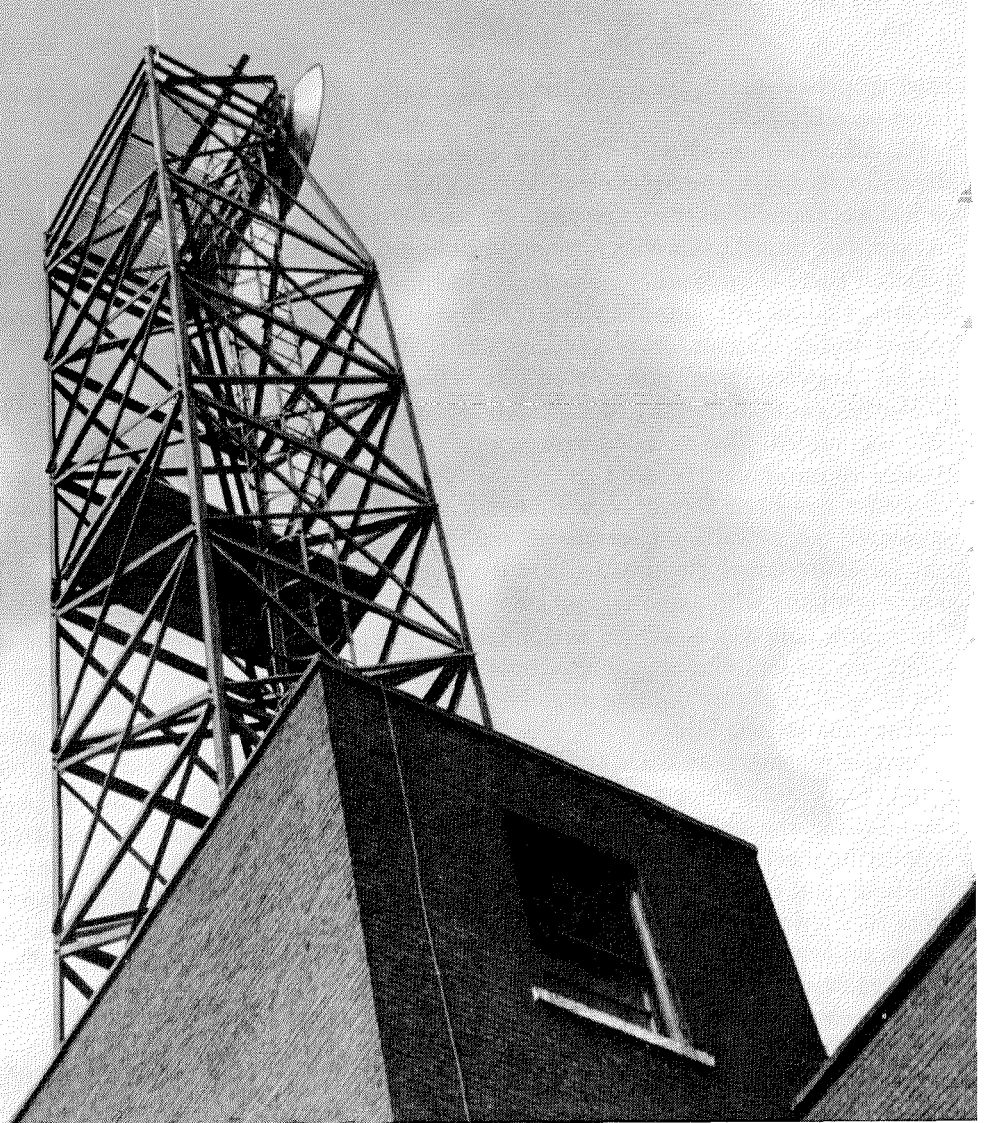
Halifax terminal showing how the steel structure of the stair well was extended to support the antennas and still permit another storey to be added to the building later.
